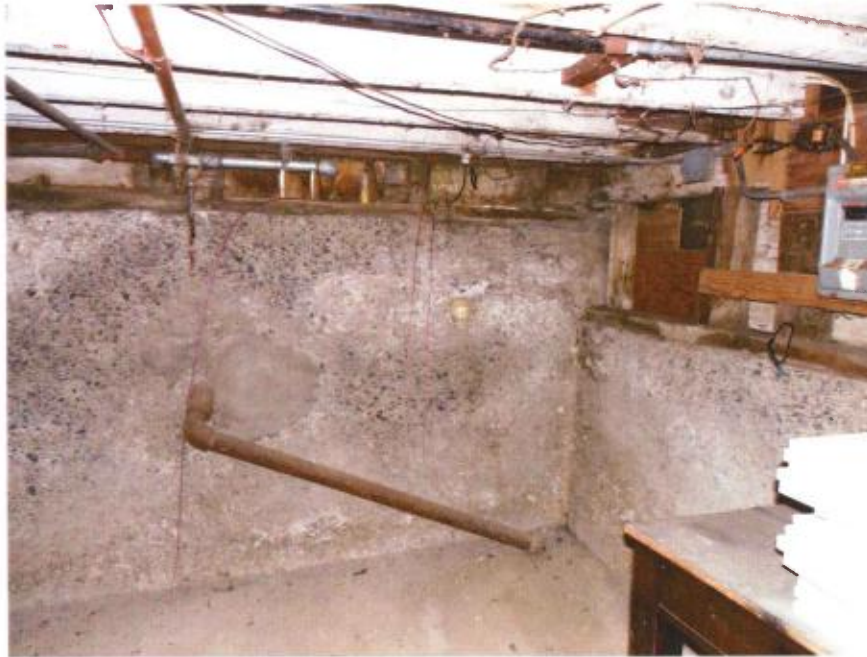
This photo shows the right rear corner of the storage area. Note the rot in the ends of the joists adjacent to the entry porch, and the repair beam at the corner.
